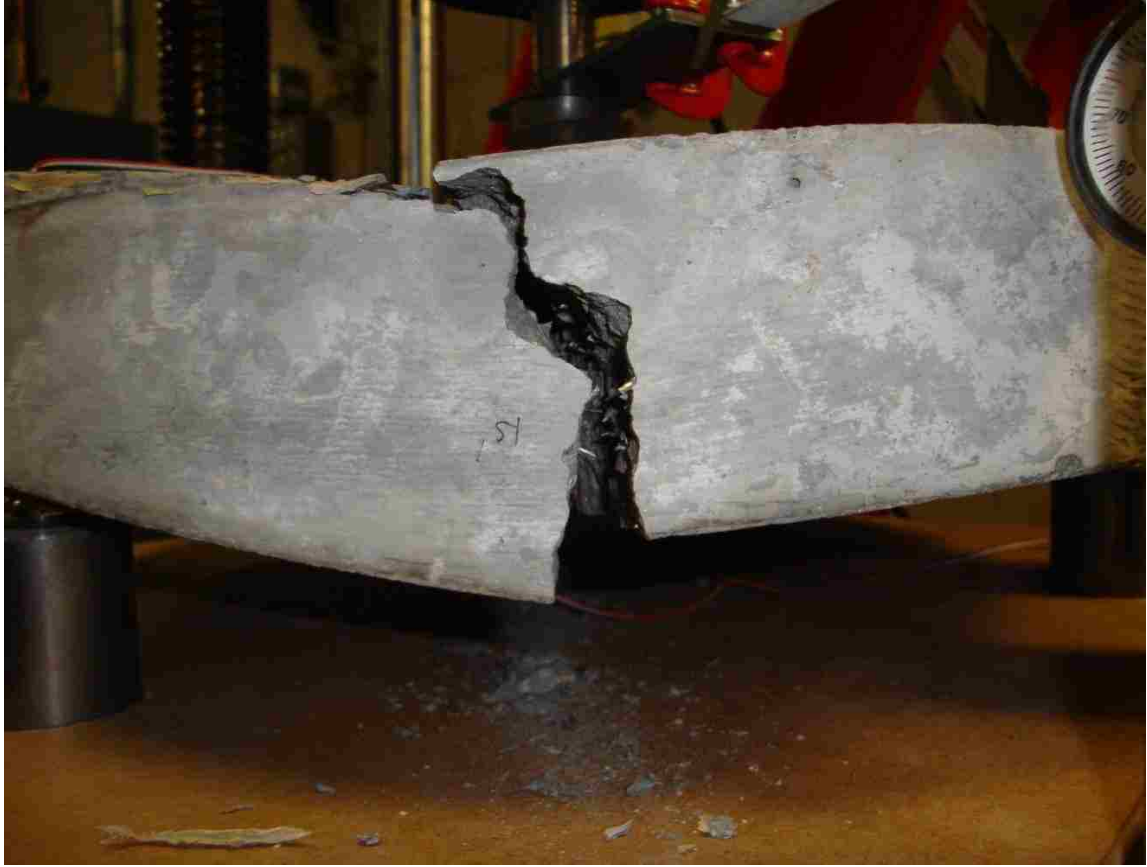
Crack and failure patterns for 1% HSSFRC circular plates under a concentrated center load
